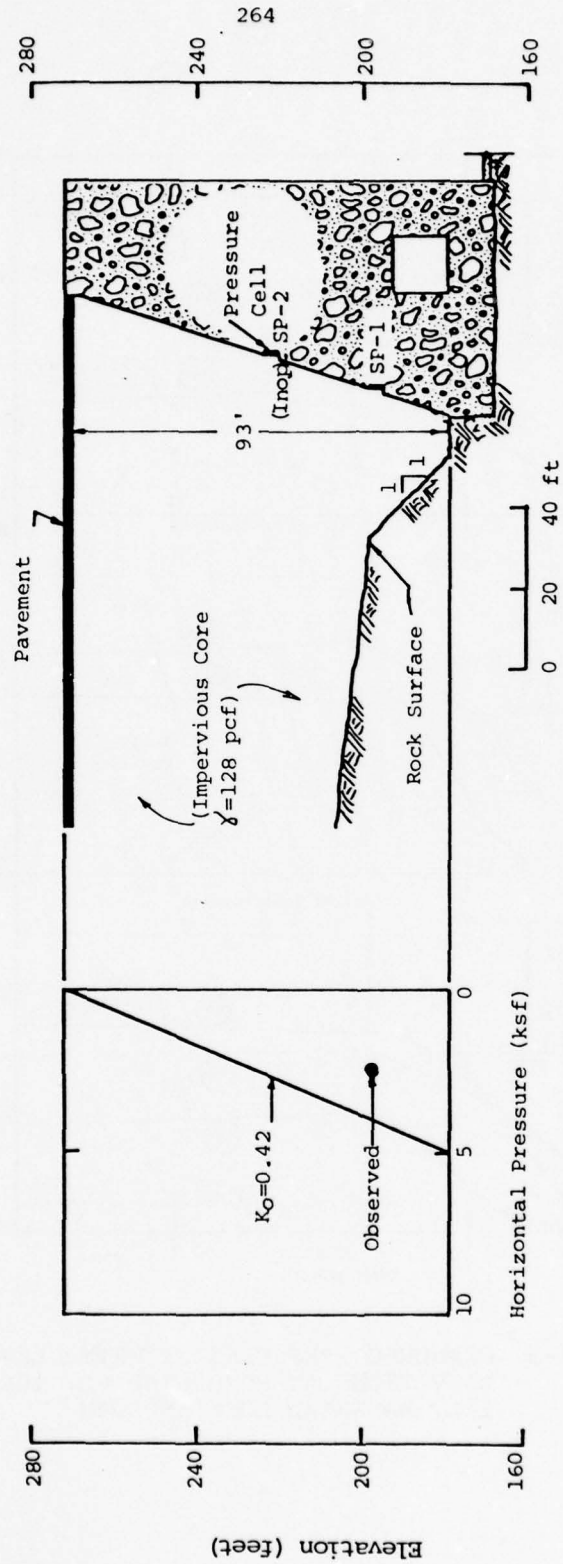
TOTAL EARTH PRESSURES AT END OF CONSTRUCTION, MONOLITH 6L, BANKHEAD LOCK DAM
